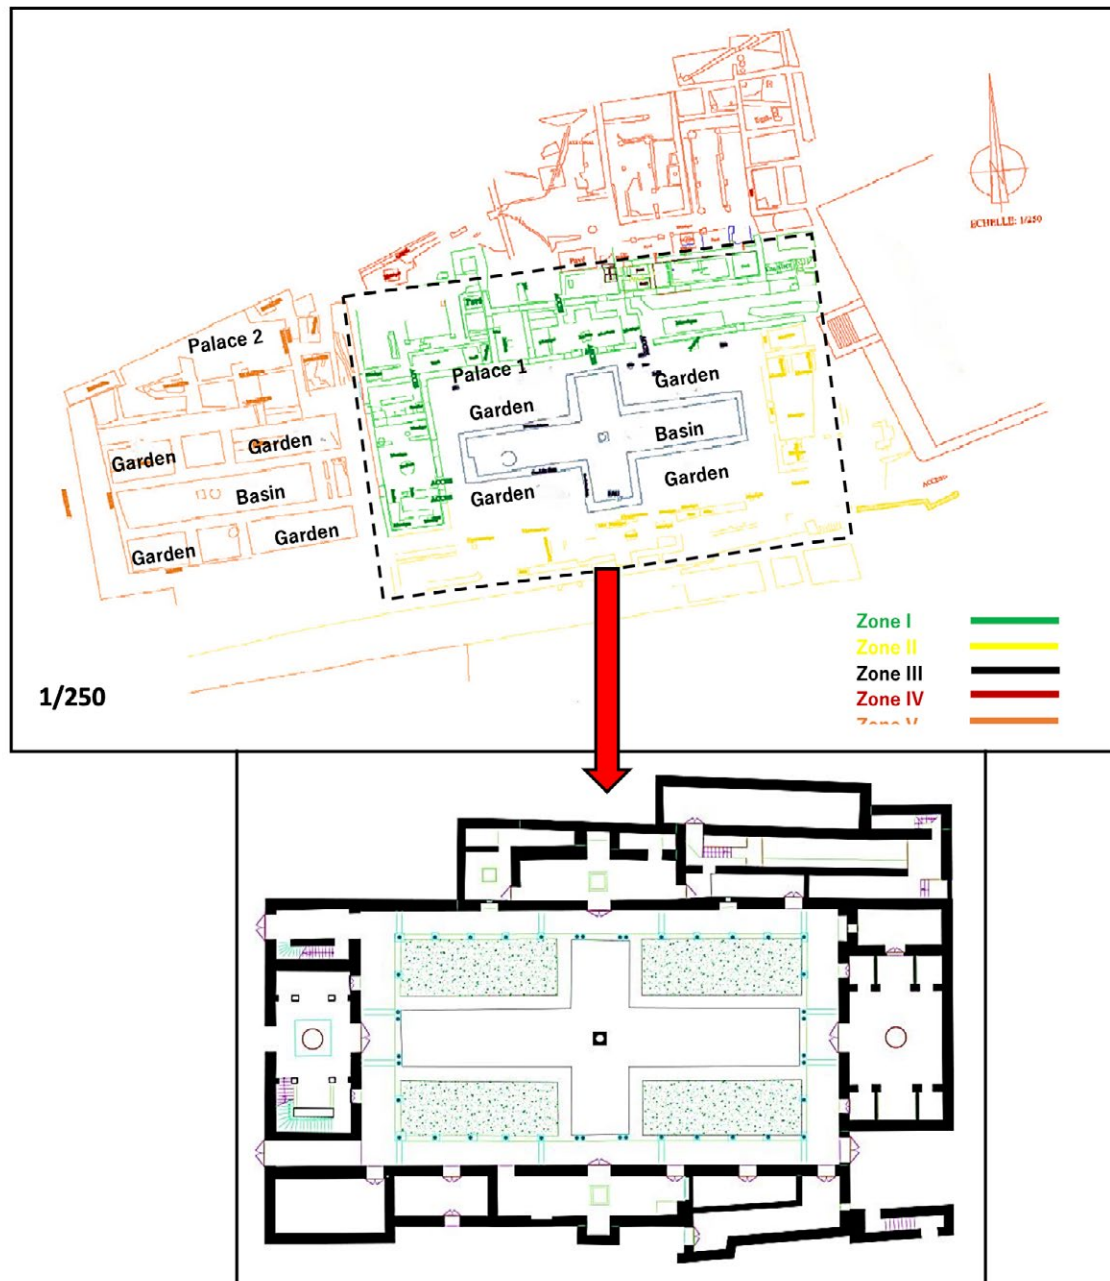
Highlighting the reconstructed section at the Mechouar site.
